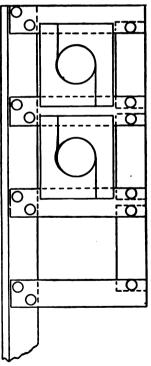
Elevation and Plan of Insulators Held in Angle-Iron Frames.
